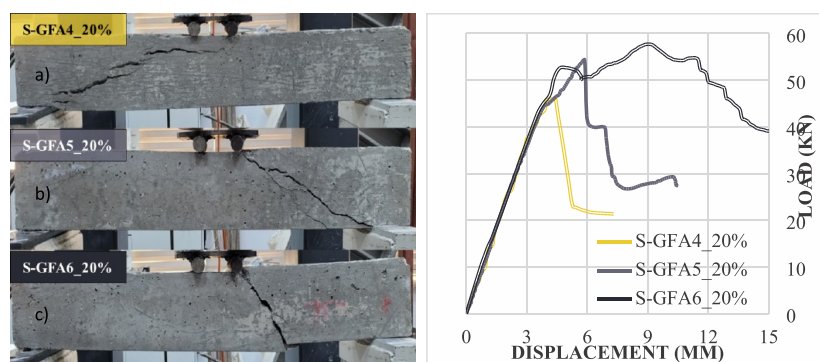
Assessment of failure patterns for 20% GFA with spacing of stirrup of (a) 270 mm, (b) 200 mm, and (c) 160 mm.
